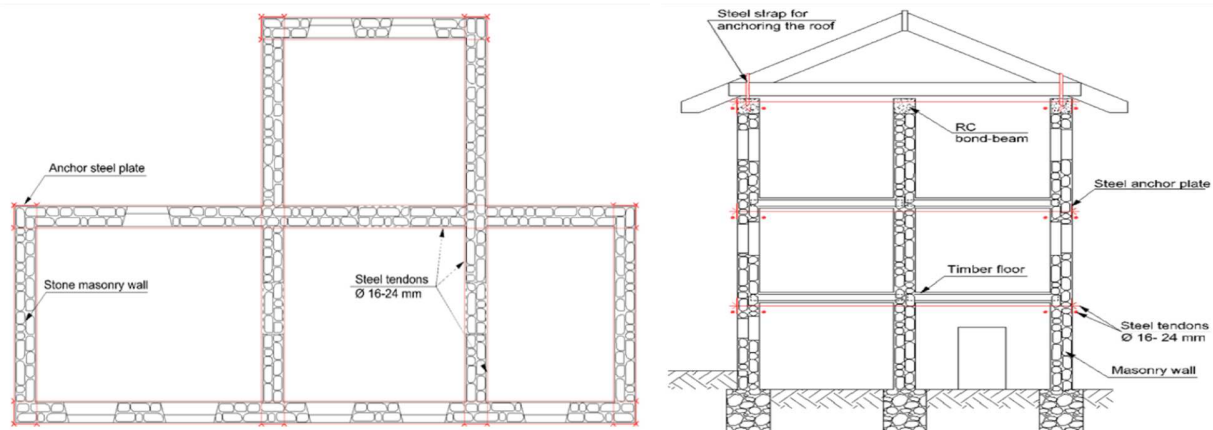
Steel Tendons Running on Both Sides of the Wall
